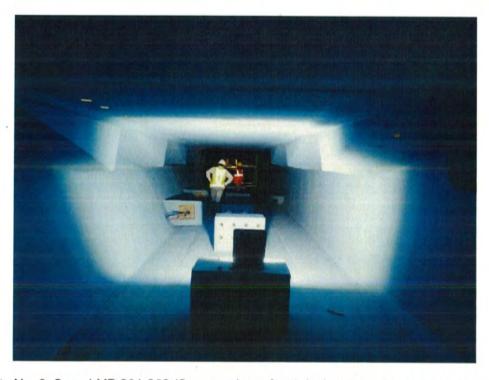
Span LMP 281-282 (Segment inner face) Anti-carbonation paint coating work
